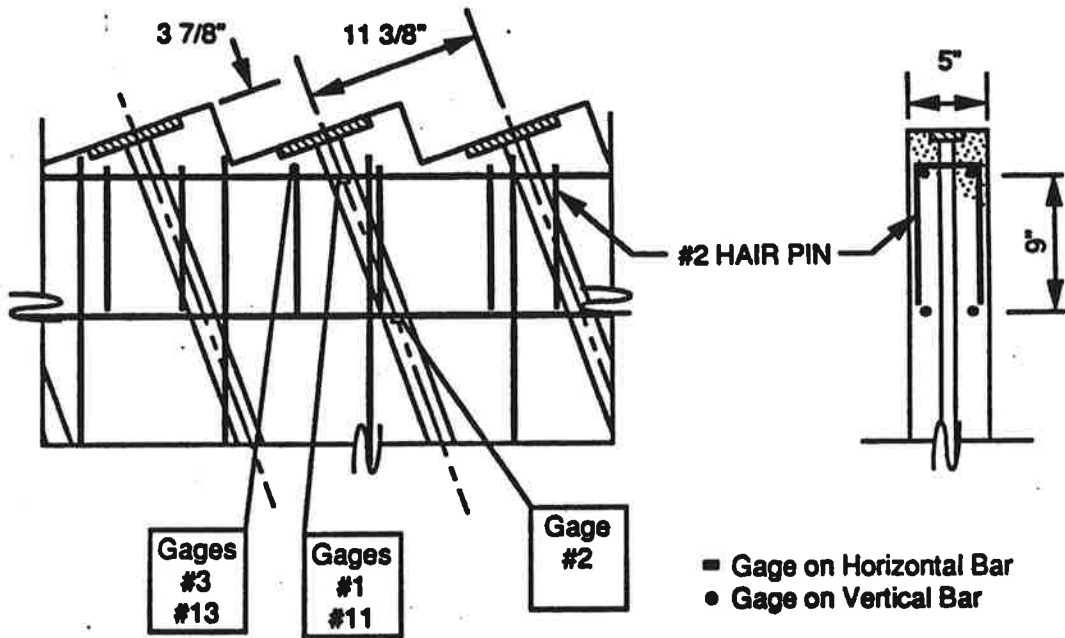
Plan of Slab #5 - 20 Degree Inclined Ducts
